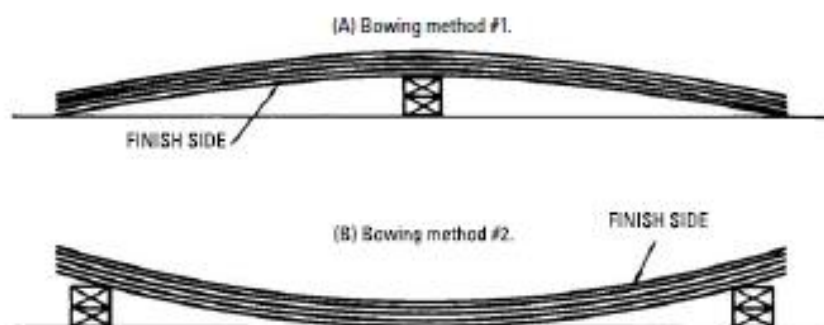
Bowing wallboard for the adhesive method of installation. (Courtesy National Gypsum Co.)
